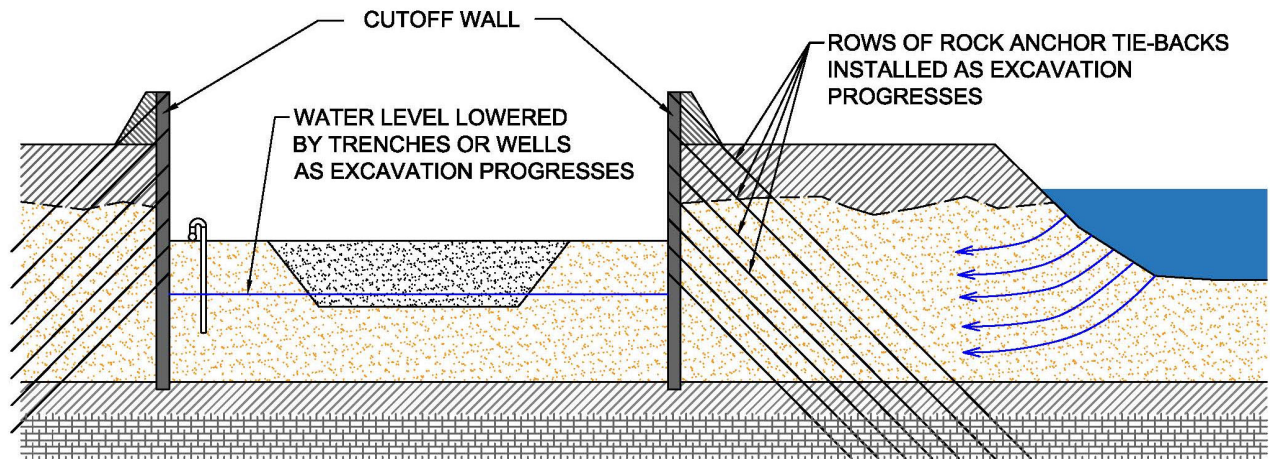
Illustration of Cutoff Wall with Tie-Backs
